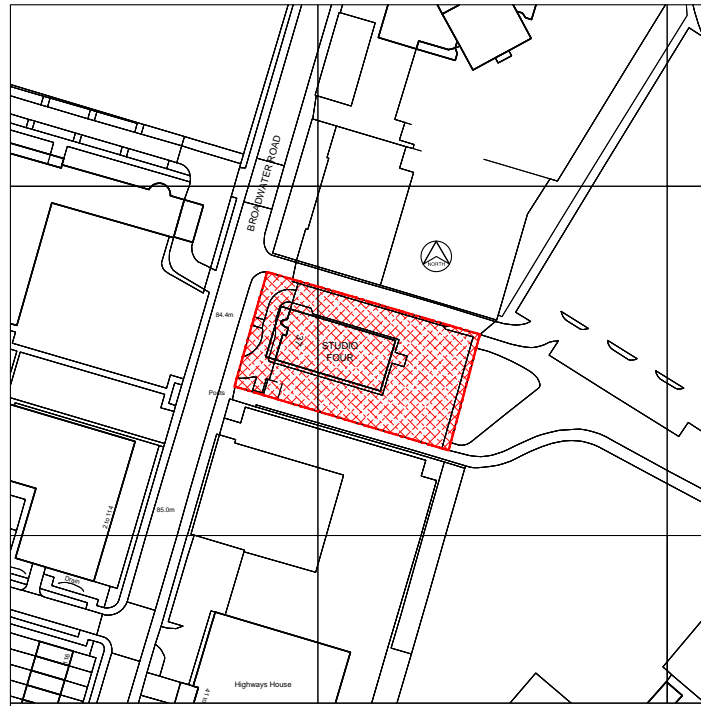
Site location plan, in red, North to top (source: As provided by Architect)
